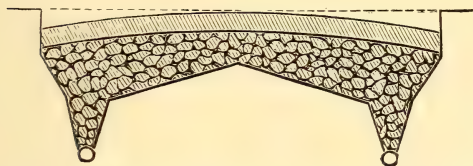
Cross-section of Carriage Drive or road for heavy traffic, showing side drain-pipes, rubble foundation, and finer material at the surface.
